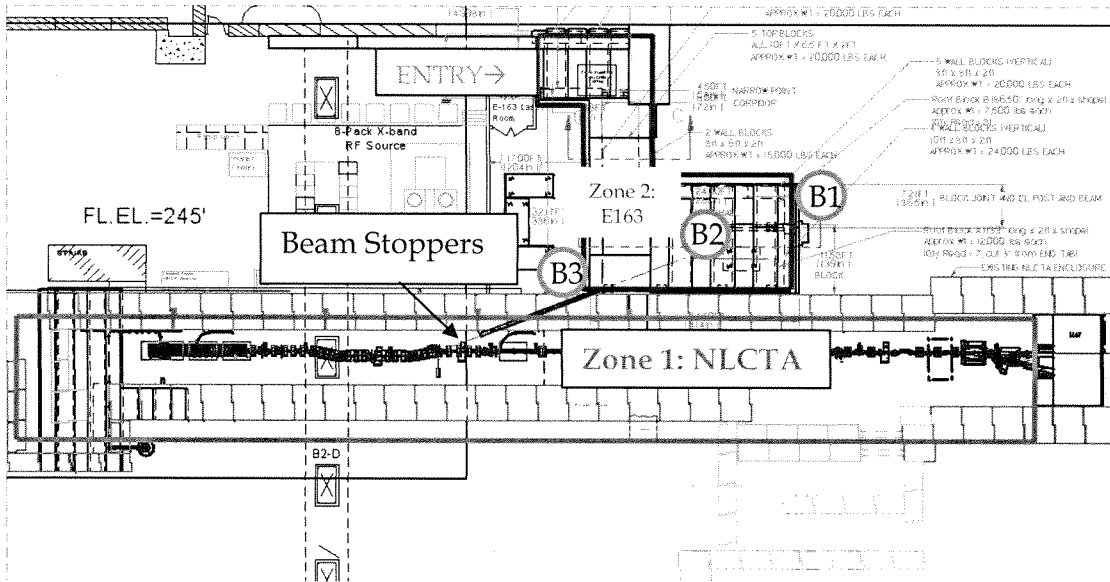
NLCTA and E163 Experimental Hall and PPS zone designations, and BSOIC locations. B1 – outside at ground level, B2 – outside, on the Experimental Hall roof, B3 – inside Laser Room at Southeast corner.
